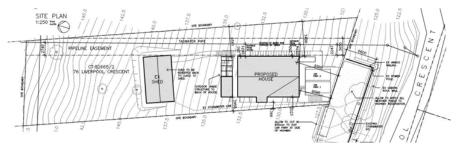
Applicant Site Plan (Steven Spizick Architect, 2021)
